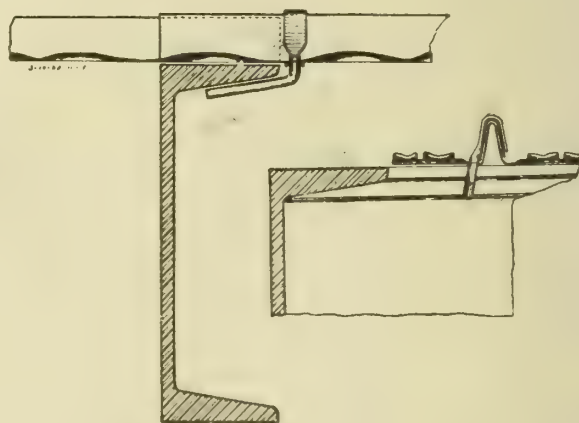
ROOF CONSTRUCTION SHOWING METHOD OF FASTENING PLATES TO PURLINS
